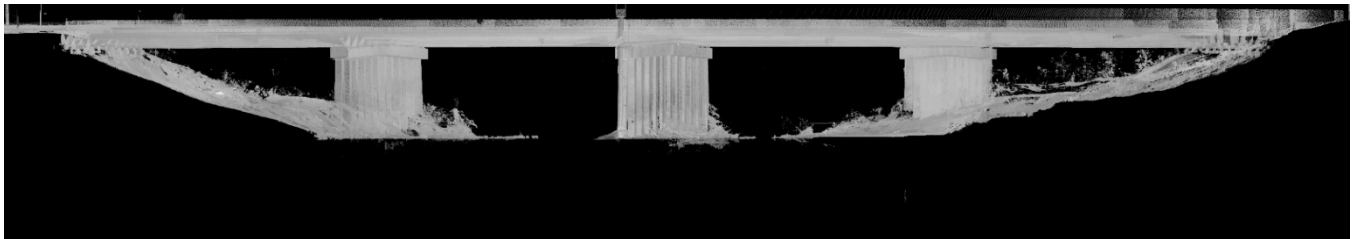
Example bridge scan point cloud illustrating the bridge skew and pier locations
